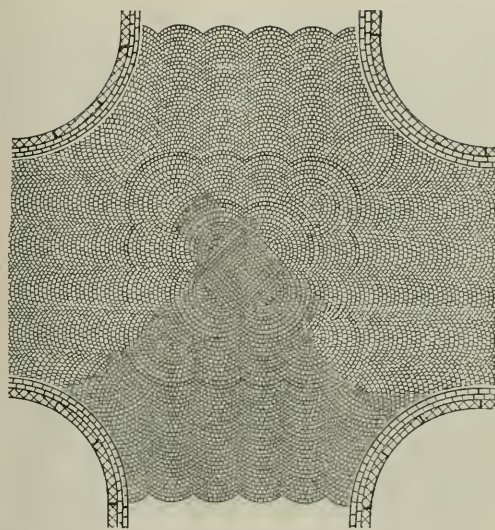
STREET INTERSECTION PATTERN, GERMAN DESIGN
